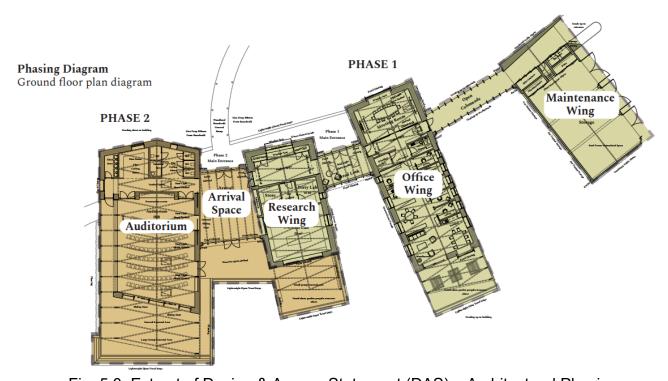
Extract of Design & Access Statement (DAS) – Architectural Phasing
